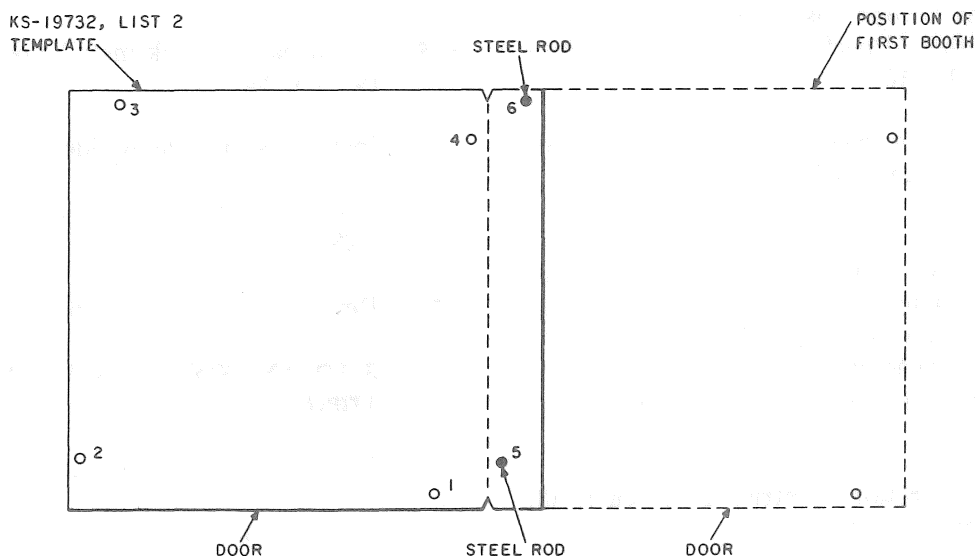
Right to Left Layout for Drilling Mounting Holes
